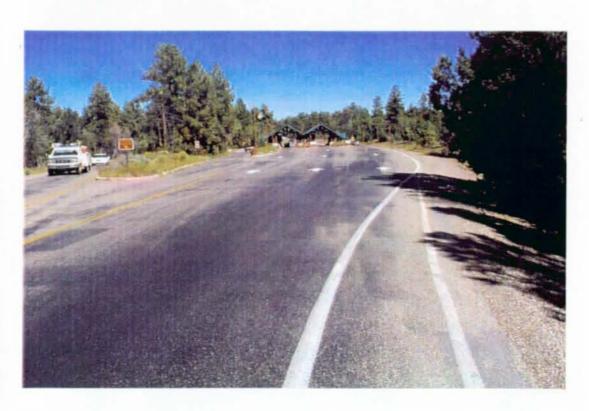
MP 0.44 - Begin widening for South Entrance Station.
